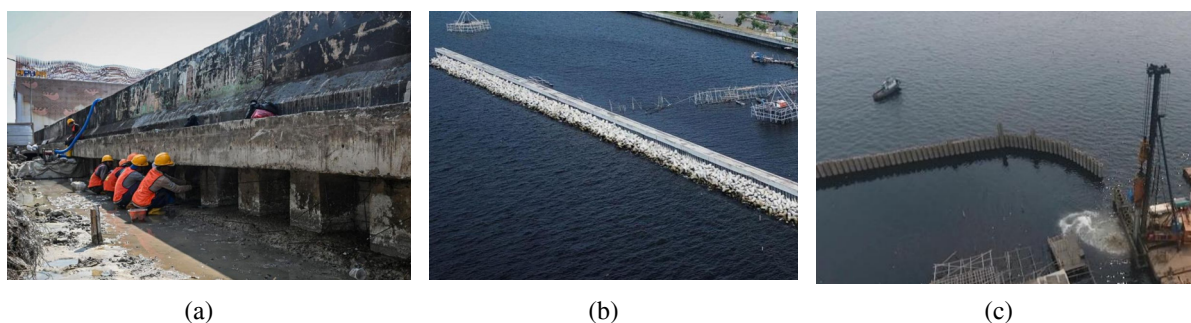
Jakarta's GSW Construction using: (a) Corrugated Concrete Sheet Piles, (b) Pile Construction Combined with Armour Units, (c) Cylindrical Piles [1]
